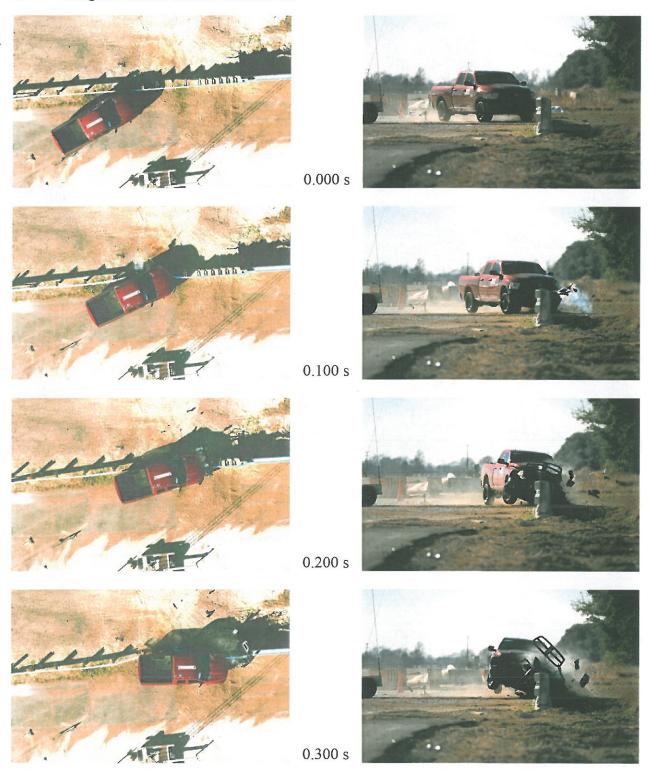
Sequential Photographs for Test No. 608331-01-6 (Overhead and Frontal Views).
